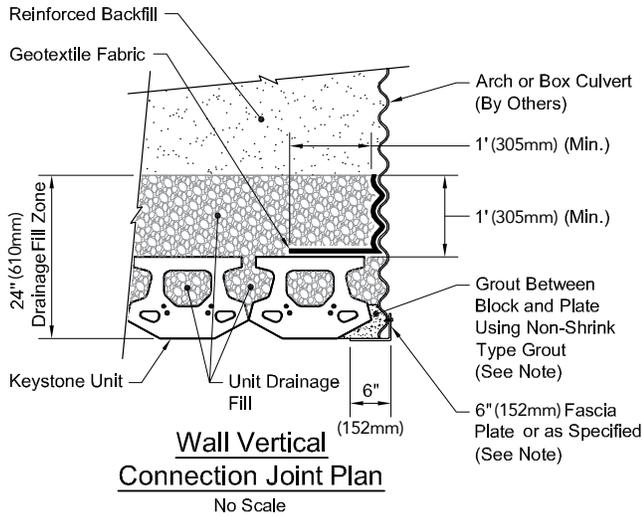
TYPICAL DRAINAGE STRUCTURE
